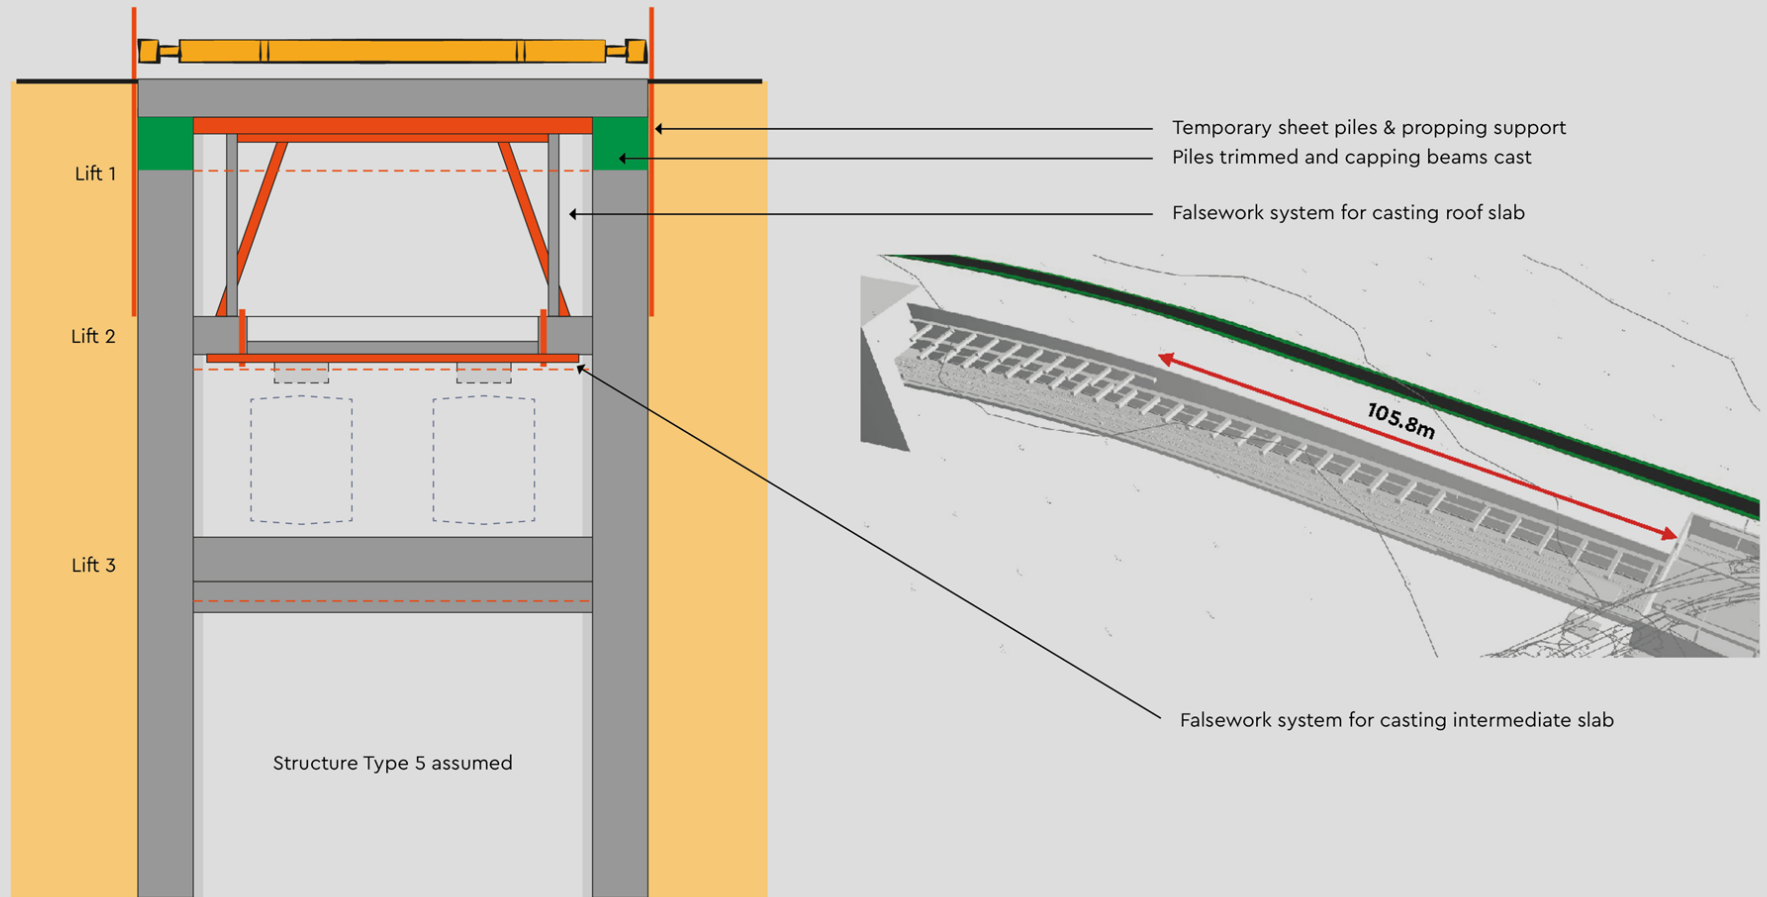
Dardistown Station Structure S7 Area 2 Construction Sequence
